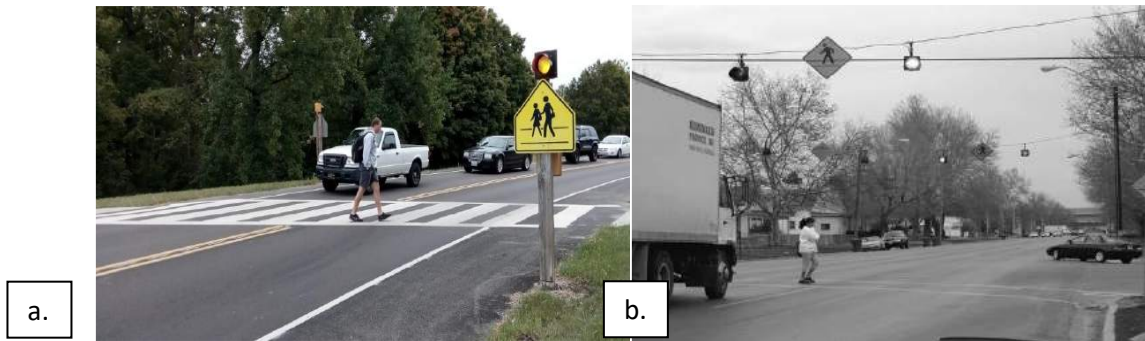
a) Pole mounted and b) Overhead flashing beacons (Fitzpatrick et al. 2006).
